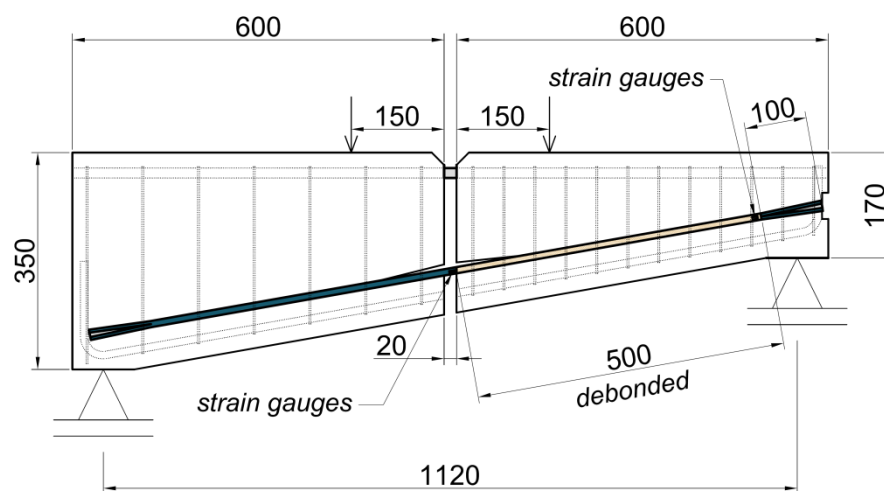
Tapered hinged-beam specimen (all dimensions are in mm)
